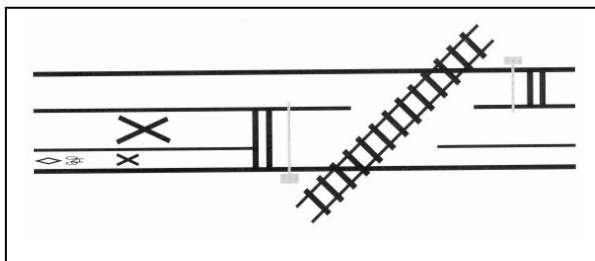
Skewed Railroad Crossing Restricted Right-of-Way Width with Gate Control
